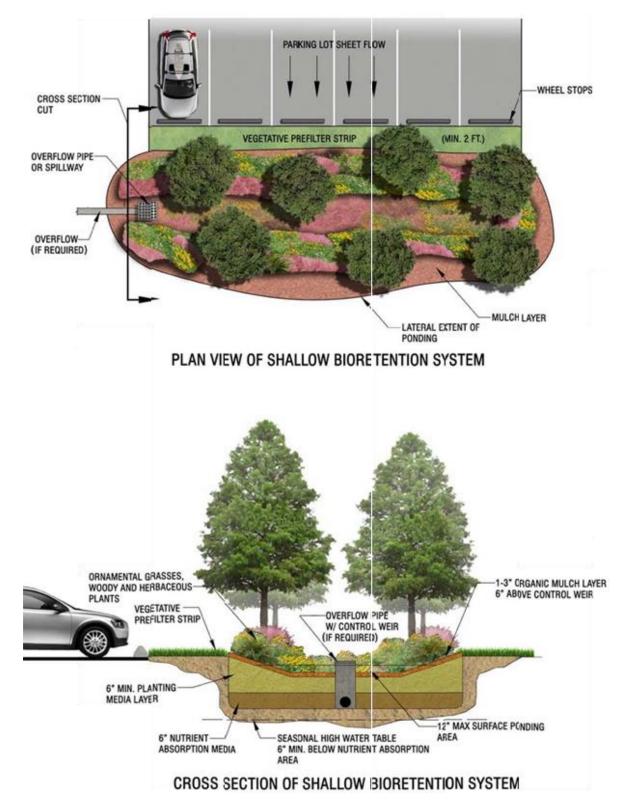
Plan and Cross-Section Views Illustrating a Shallow Bioretention System
